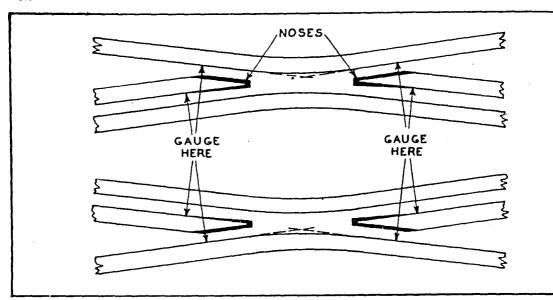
K CROSSINGS SHOWING POSITIONS OF GAUGING
